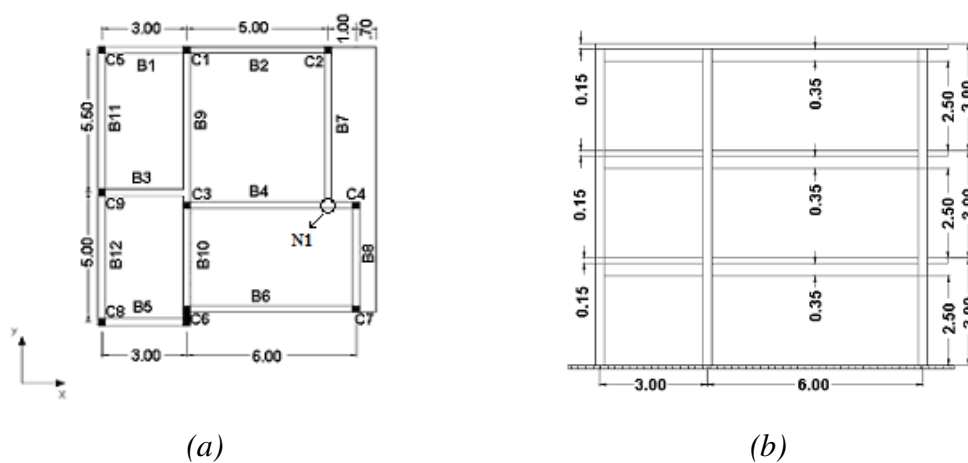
(a) Plan View (m), (b) Lateral View (m).
